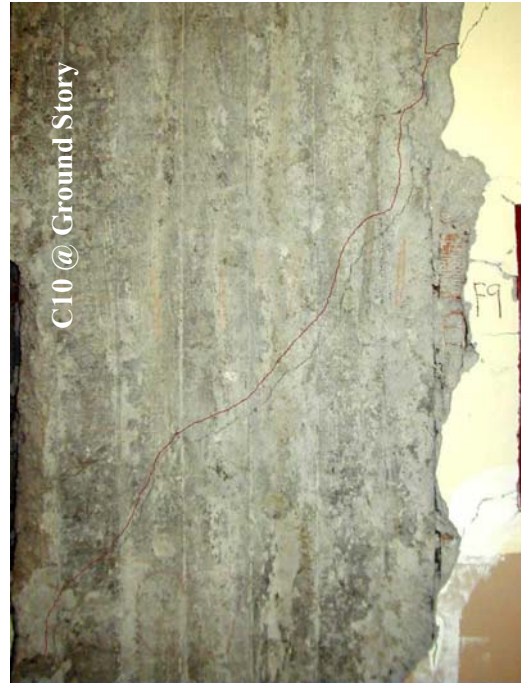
Shear cracks in the ground story column-C10 (Bolu)
